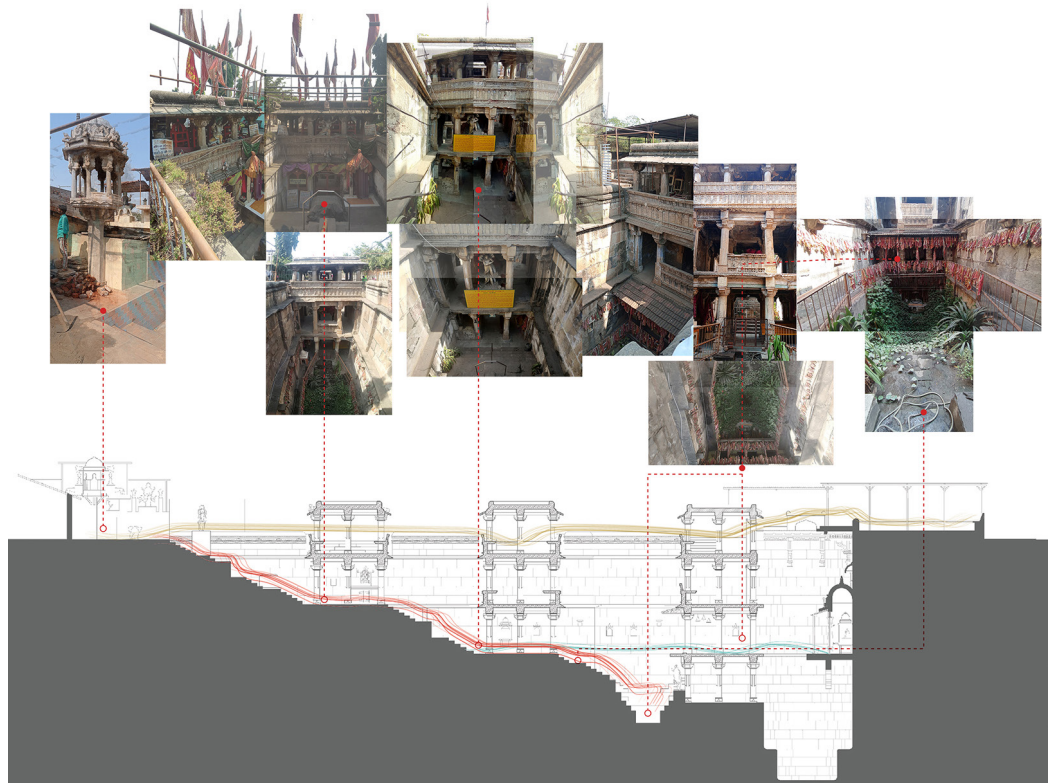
Section and images of Mata Bhavani temple stepwell the oldest underground structure in Ahmedabad built in the 11th century (images by the authors).
